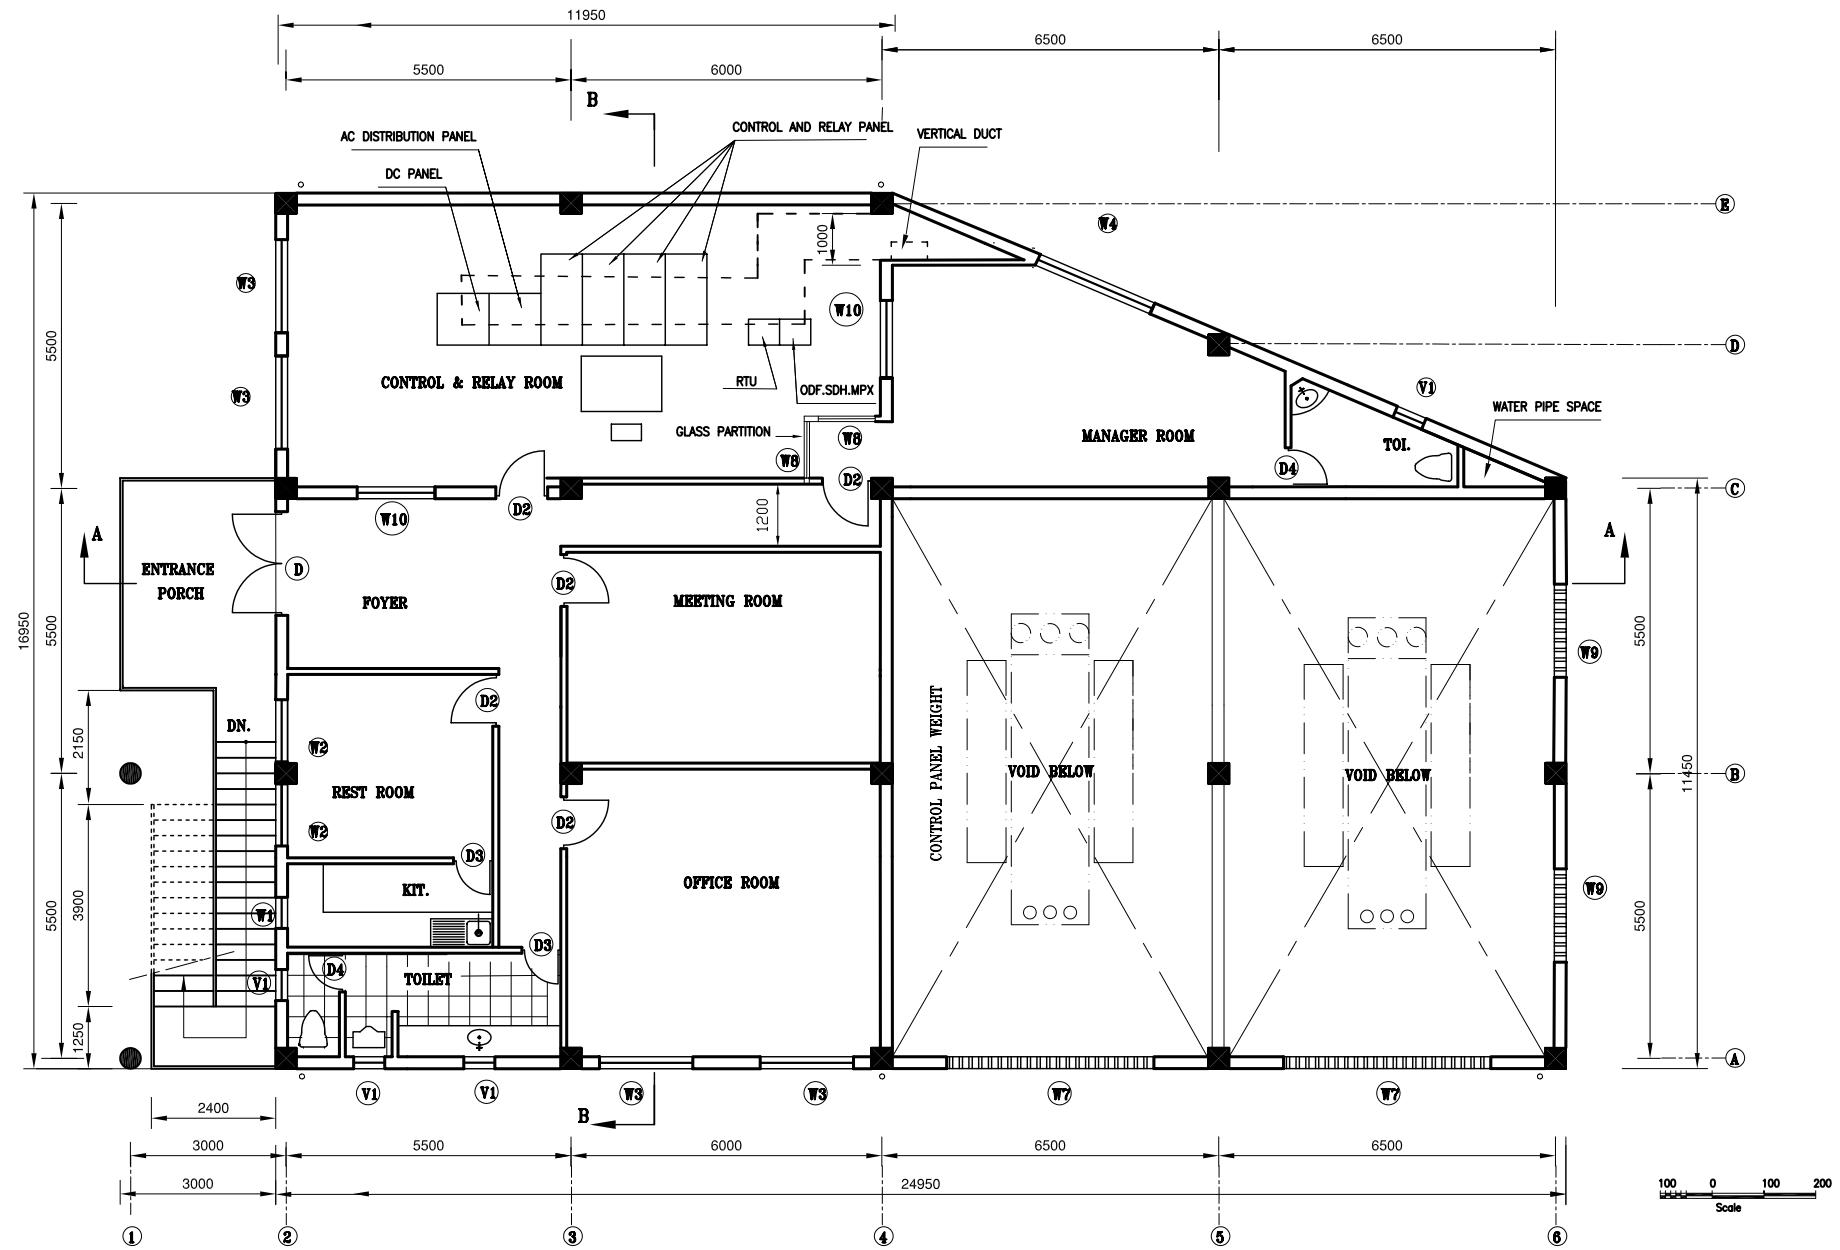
K3 S/S 1st Floor Plan (Control Room, Office and Manager Room)
